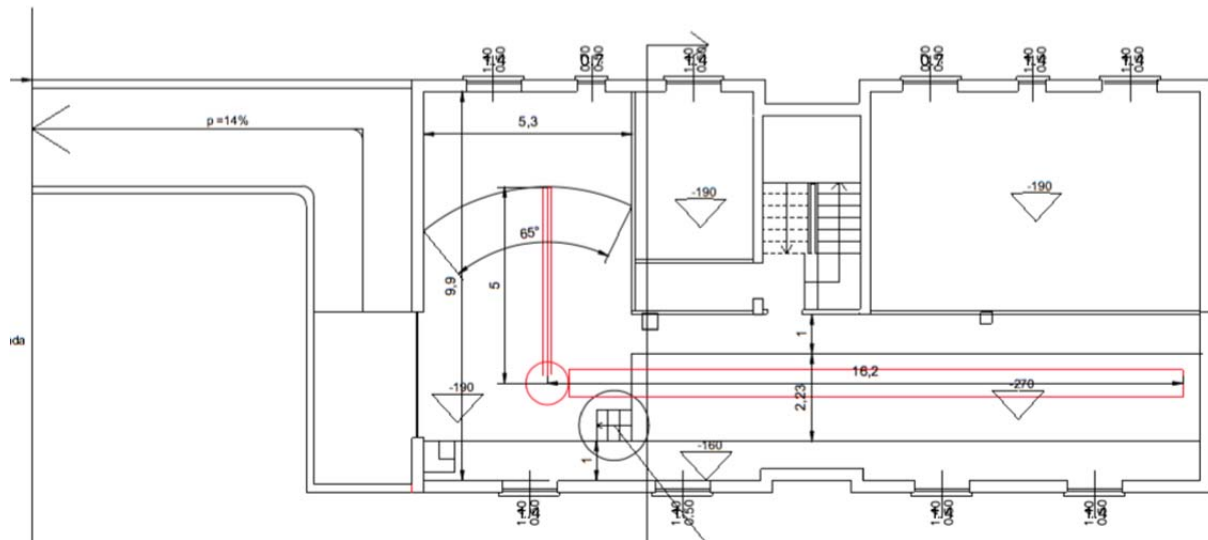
design of the new laboratory, to be realized on the basement of an existing building. The BEaTriX facility planned location is drawn in red.
